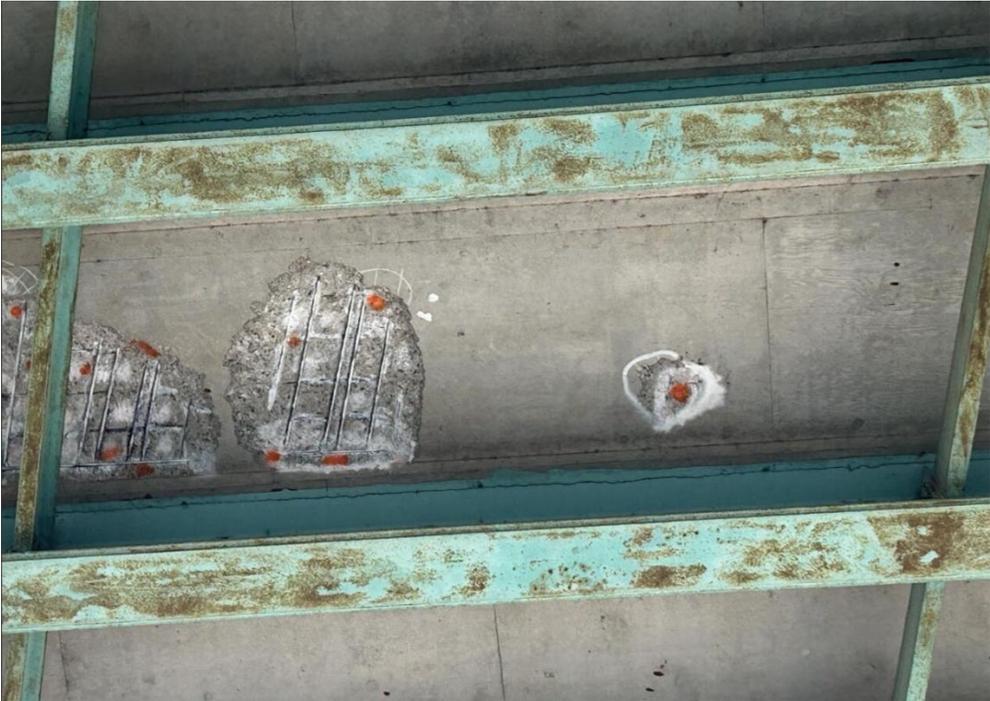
Construction of Soffit Shoring Repairs - GS4 Section (Span ID 436-104 to 436-105)
